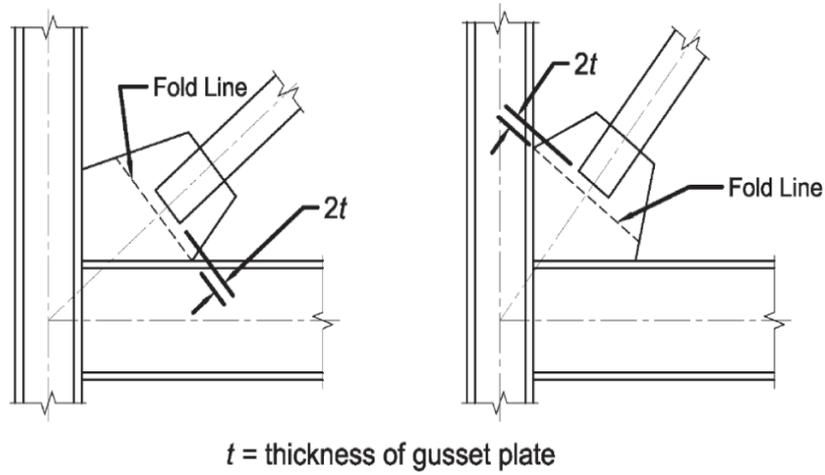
Brace to gusset plate connection for Special Concentric Bracing, from ANSI/AISC 34, 2010
